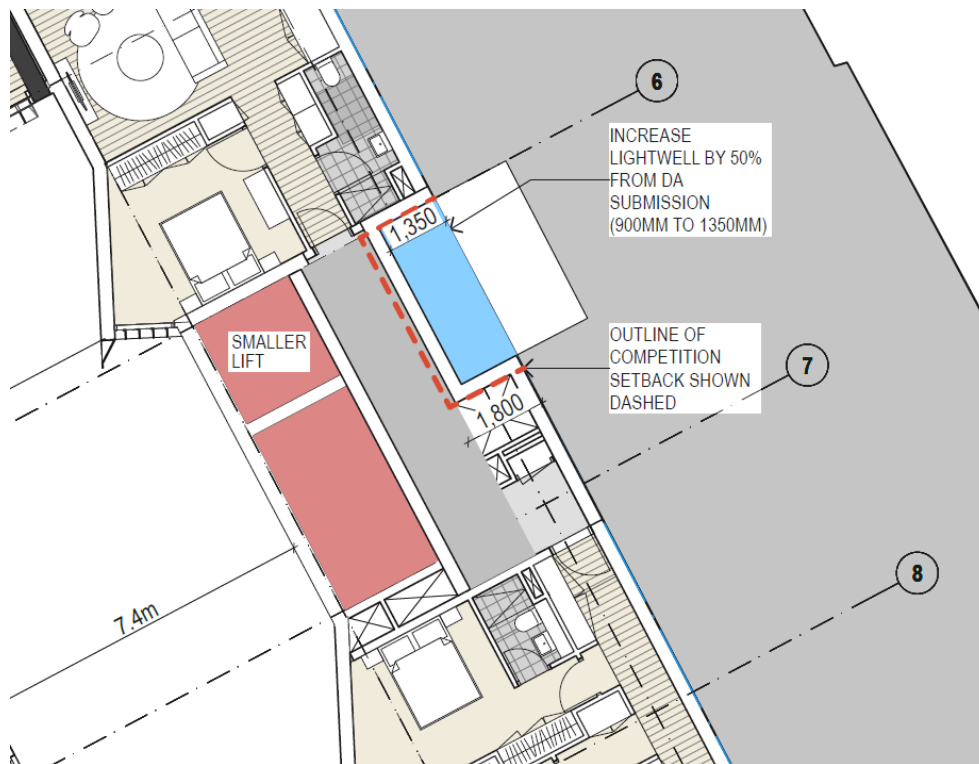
A floor plan showing the lightwell and amended proposal increasing the setback to 1.35m
